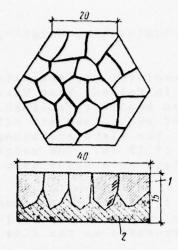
Concrete road slabs with a design by the engineer Trilinsk:
